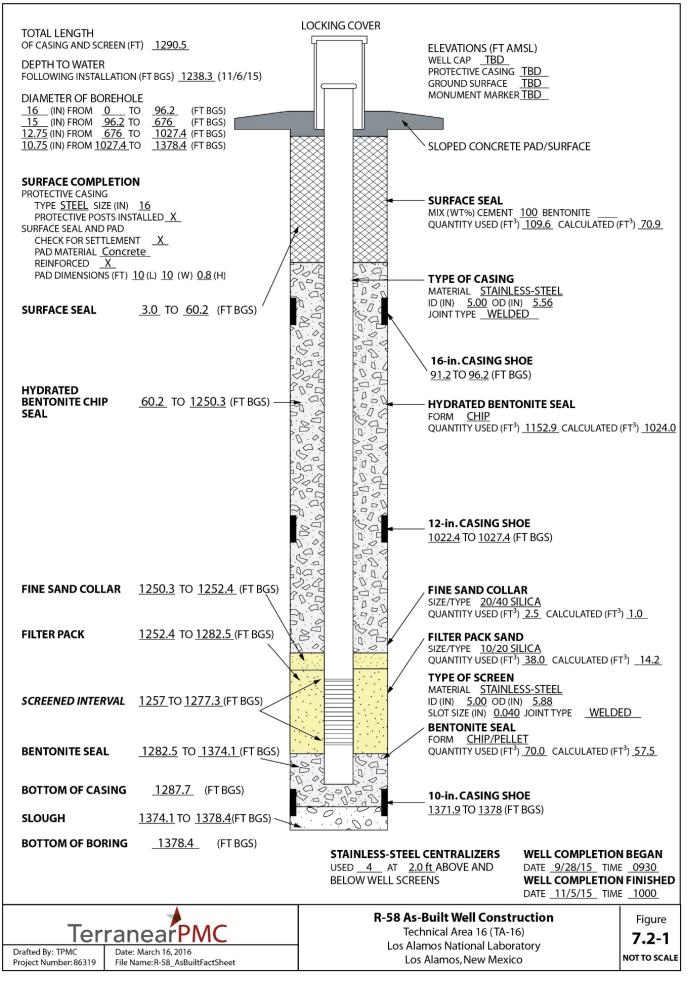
Monitoring well R-58 as-built well construction diagram
